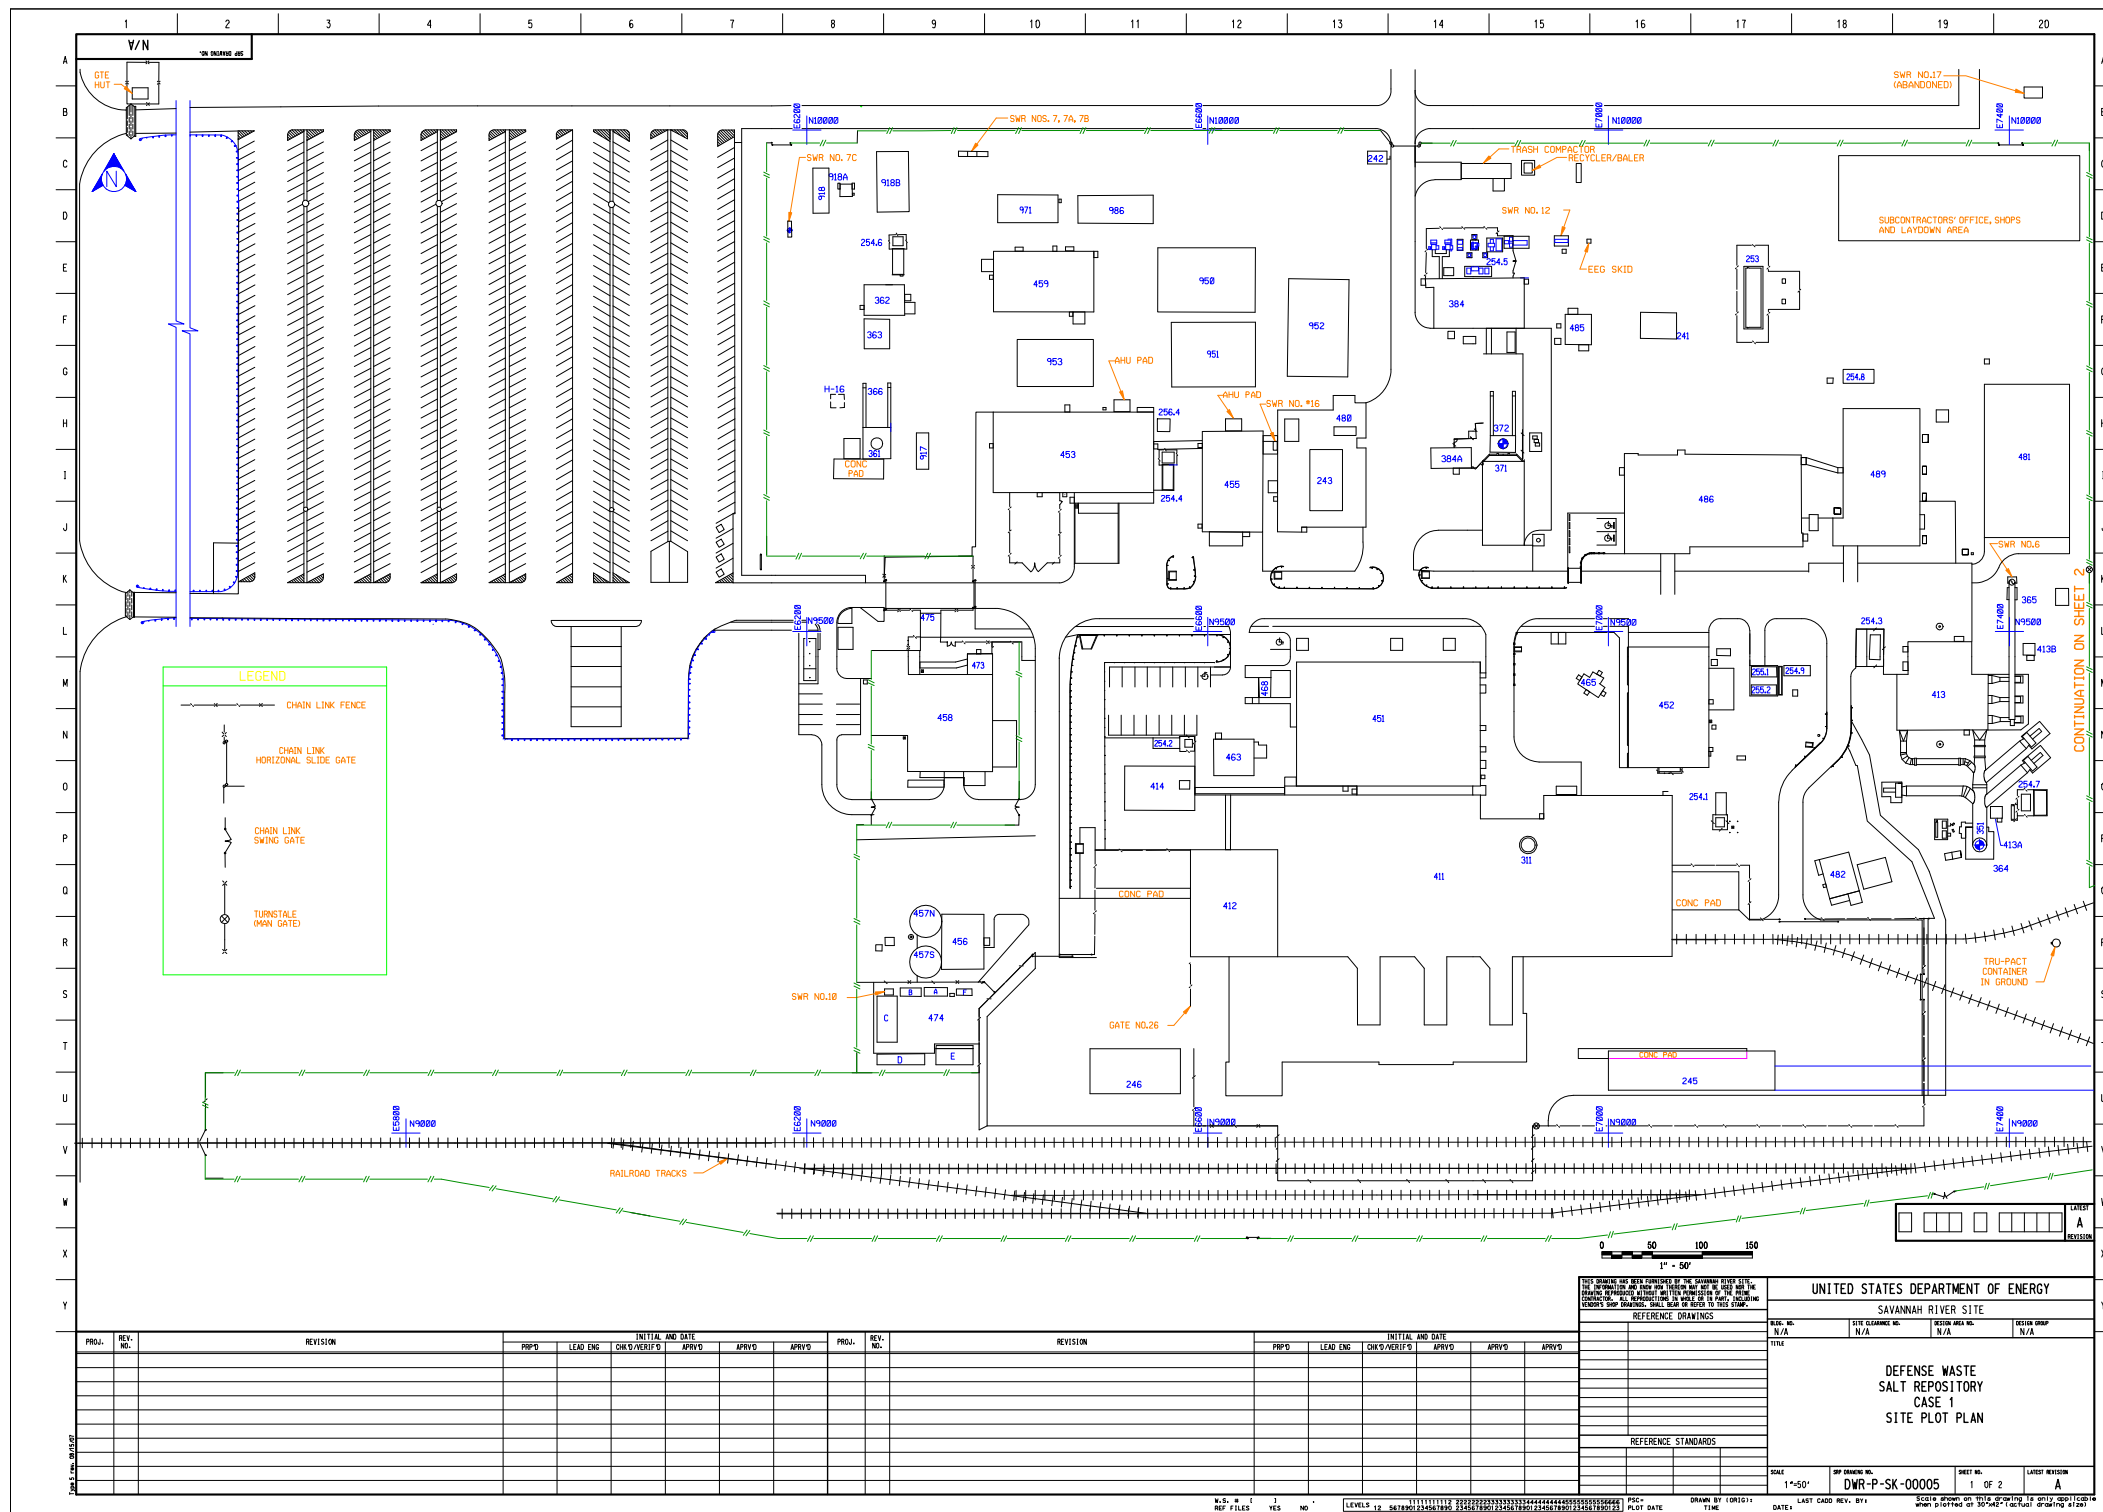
A Case 1 WIPP Surface Facilities Sheet 1 – Site Plot Plan
